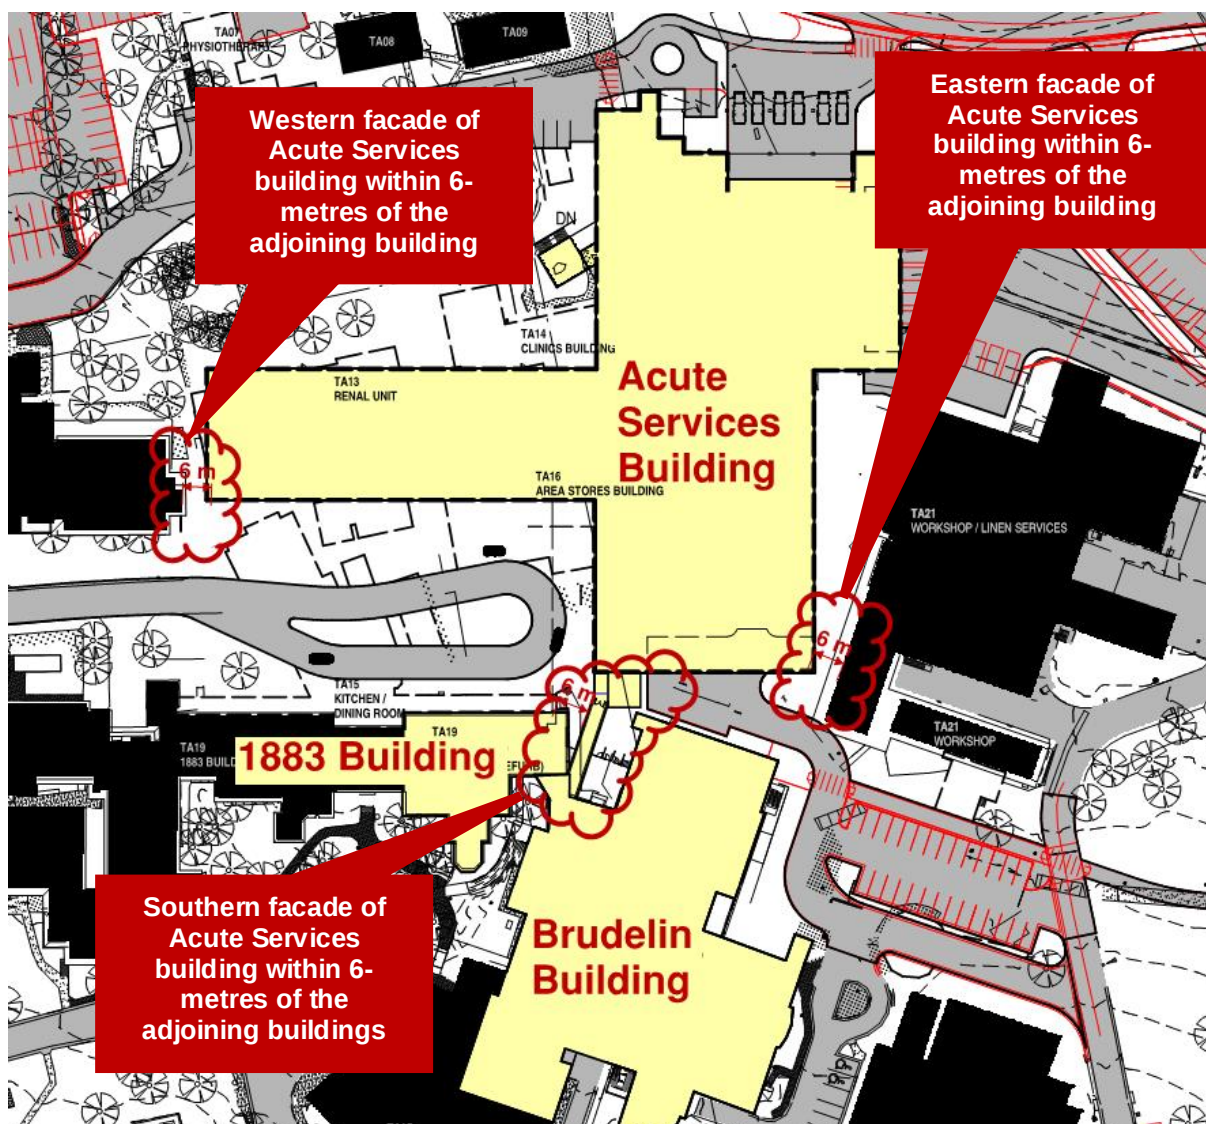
Site plan showing the proximity of the Acute Services Building within 6-metres of the adjoining buildings
